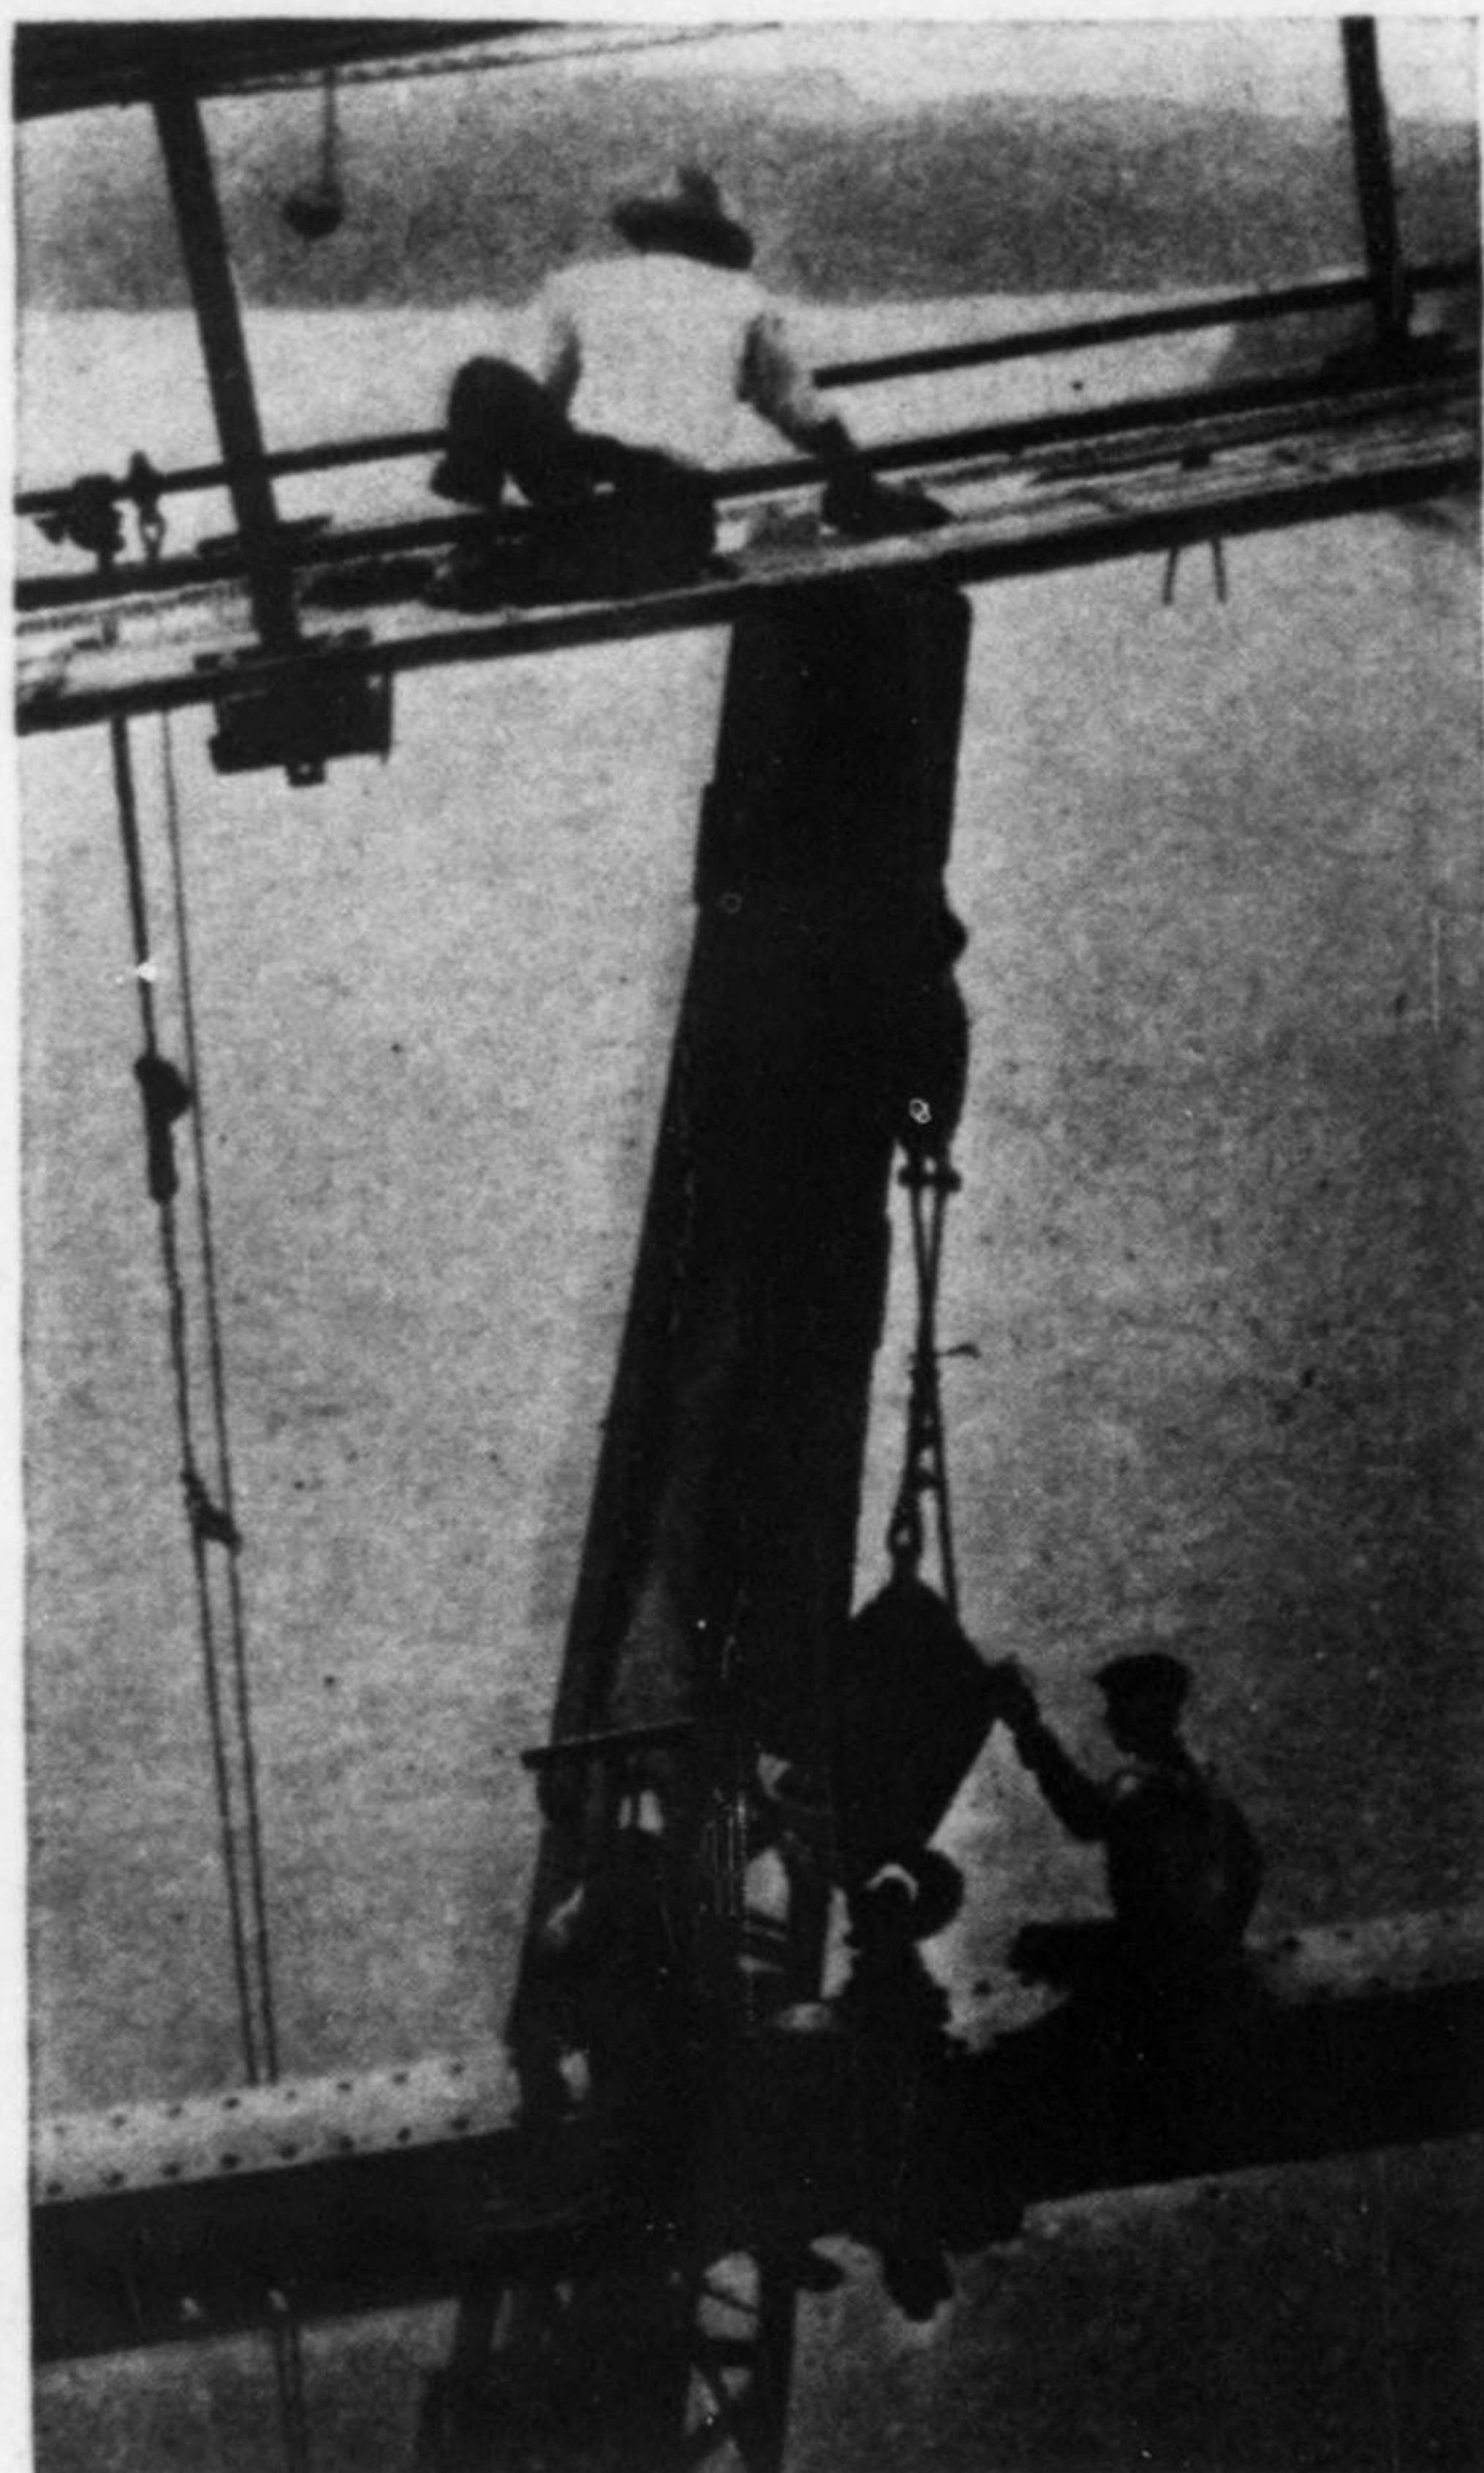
Use of footbridges for parallel-strand cable erection was important innovation on Maysville bridge. View shows boom of floating derrick setting stiffening truss but also gives good idea of footbridge make-up. Note wood crossbeams held between angle clamps, also perforated channel posts permitting vertical adjustment of footbridge.
